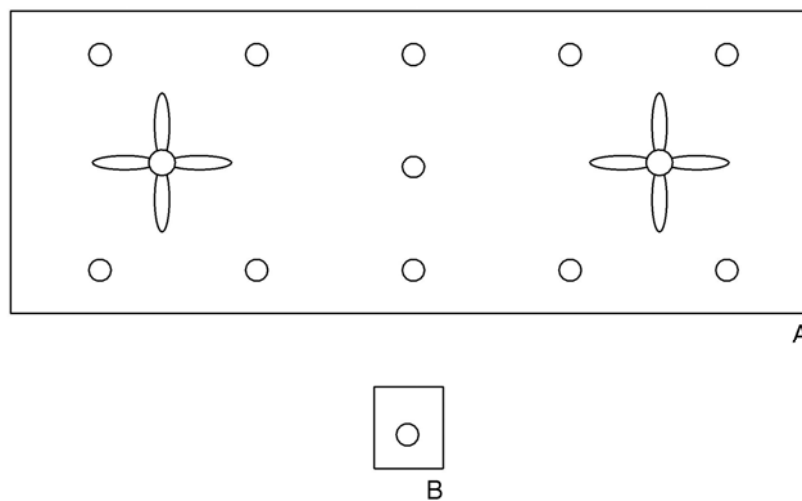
A. An example ceiling plan, where downlights and fans are duplicated, and therefore trying to find image B. within image A. can return a possible 11 results.
